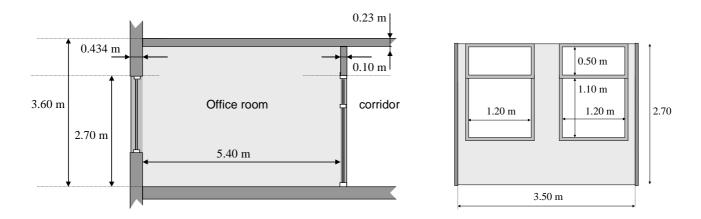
Office room (IEA 27): section (left) and facade (right).
